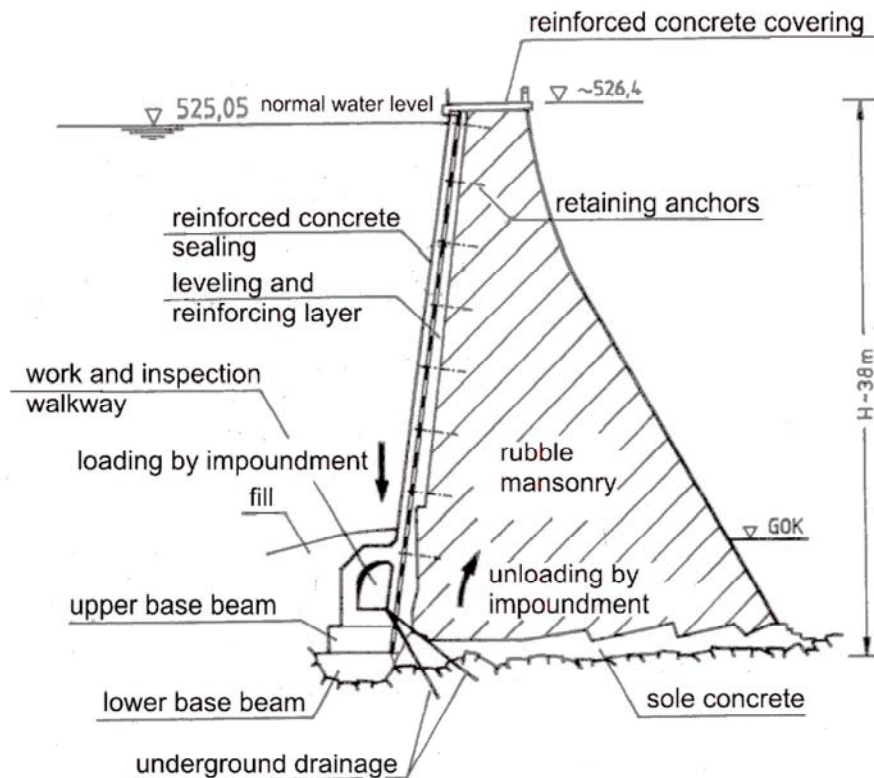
Wall cross section after the rehabilitation with reinforced concrete sealing
